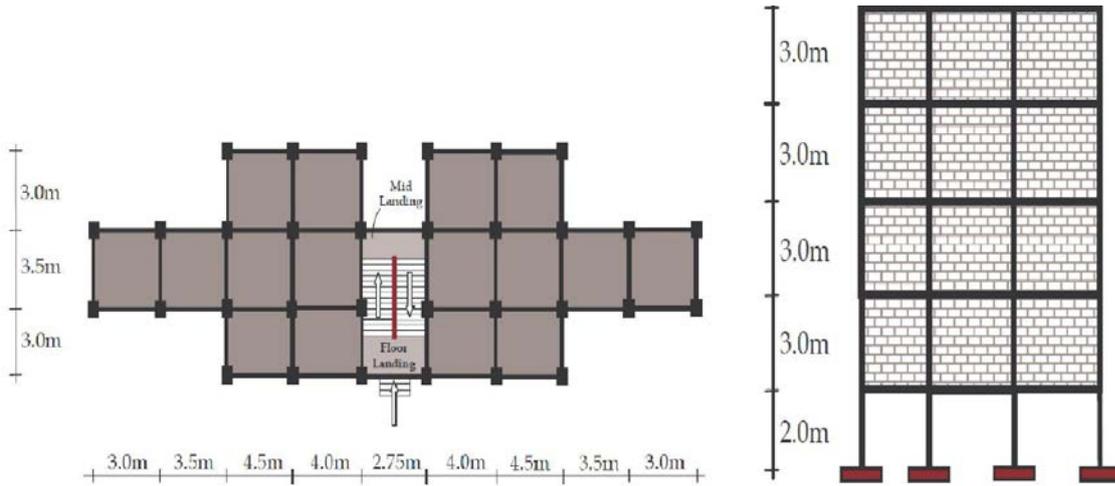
The Plan (left) and the Elevation (right) of the Building Considered.
